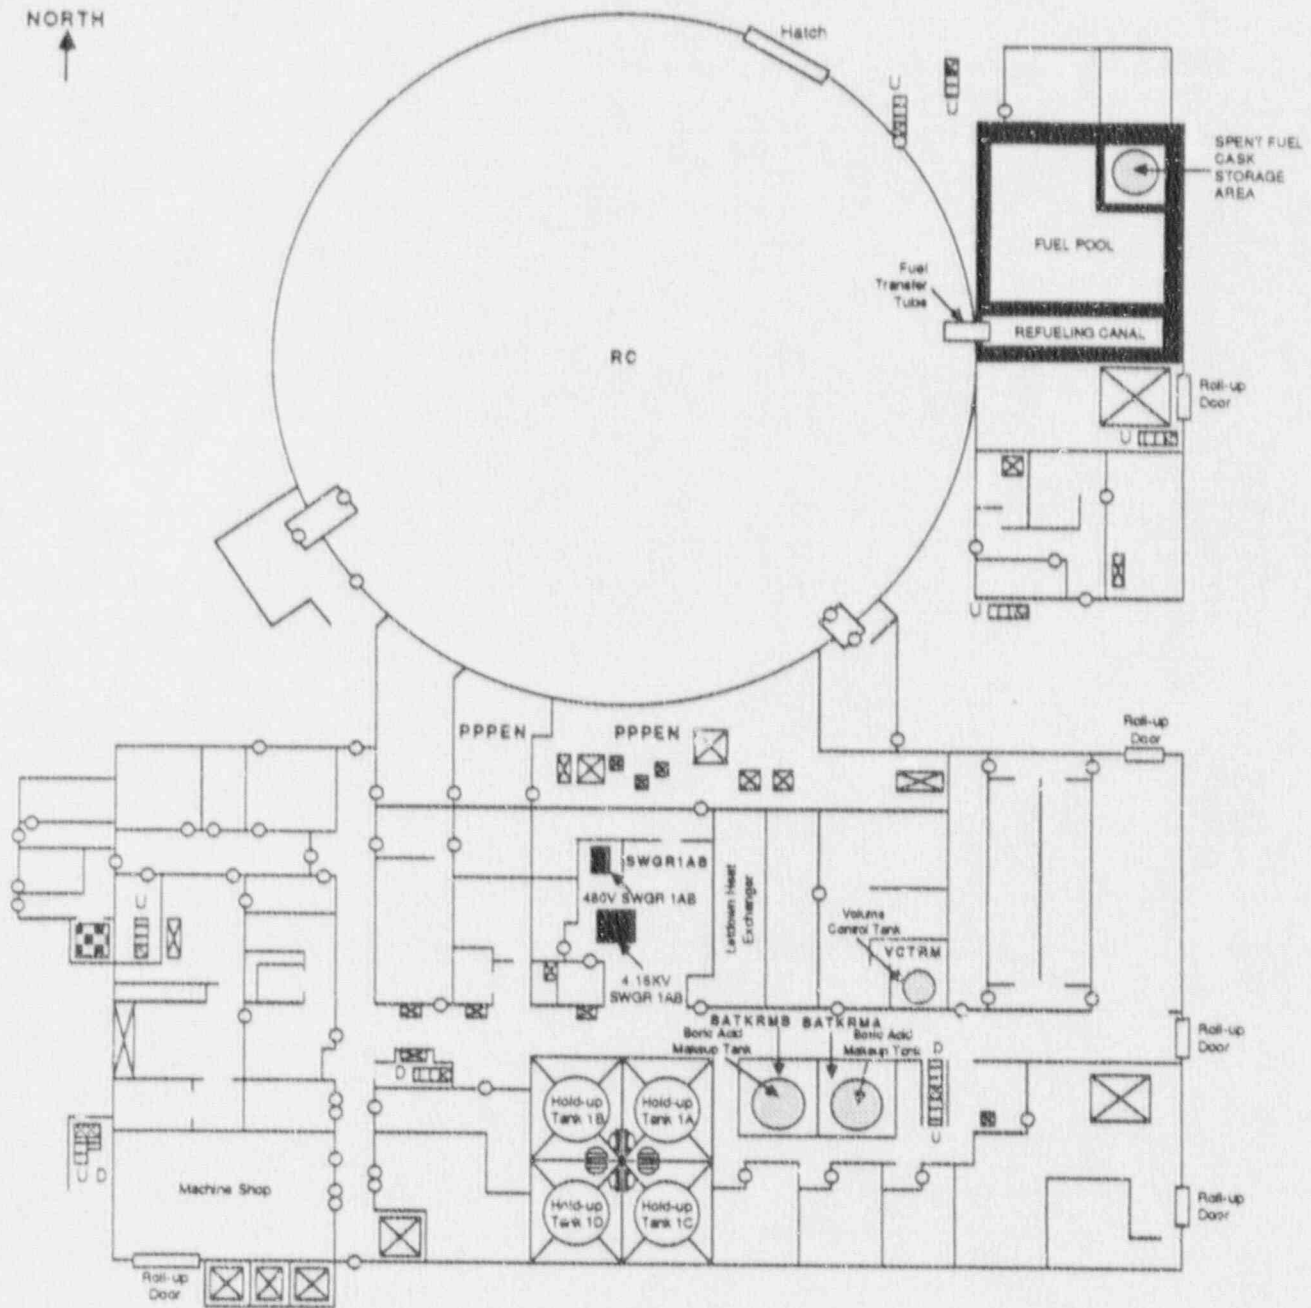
St. Lucie 1 Reactor Building, Elevation 18', Auxiliary Building, Elevation 19.5', and Fuel Handling Building, Elevation 19.5'
